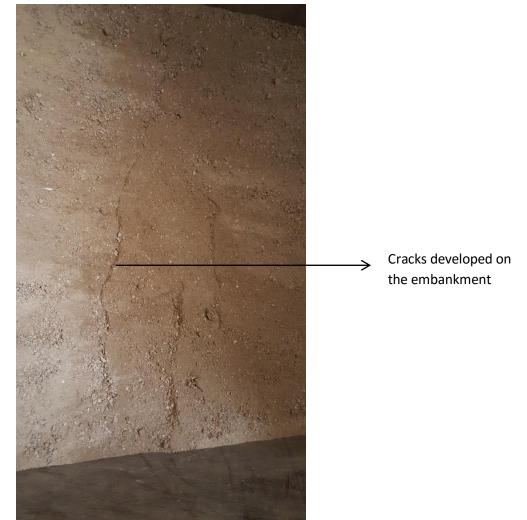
Cracks Developed due to Loading on Embankment without Micropiles
